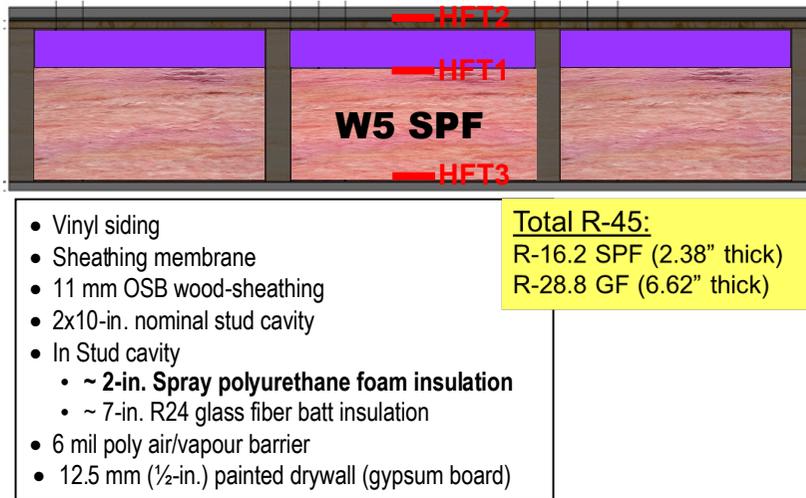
Wall 5 (W5: SPF) - Horizontal cross-section through SPF wall assembly showing locations of Heat Flux Transducers (HFT)
